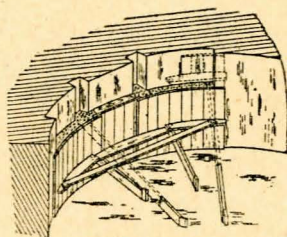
The form in place for holding the concrete for the heavy section about the doors of a bank silo.
